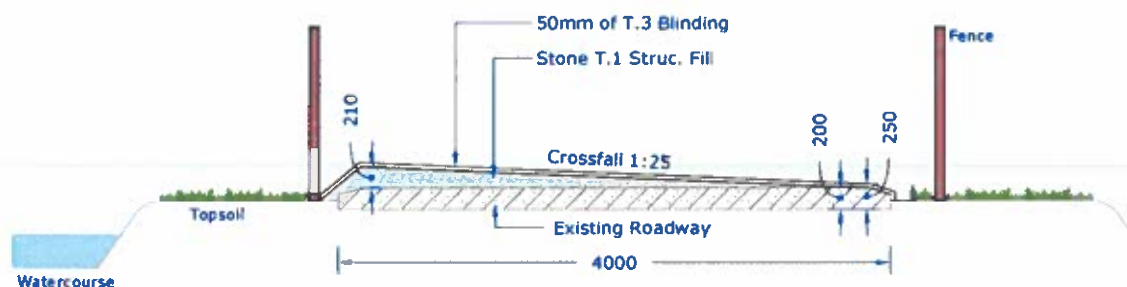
Existing Farm Roadway Upgraded (adjacent to Watercourse)
